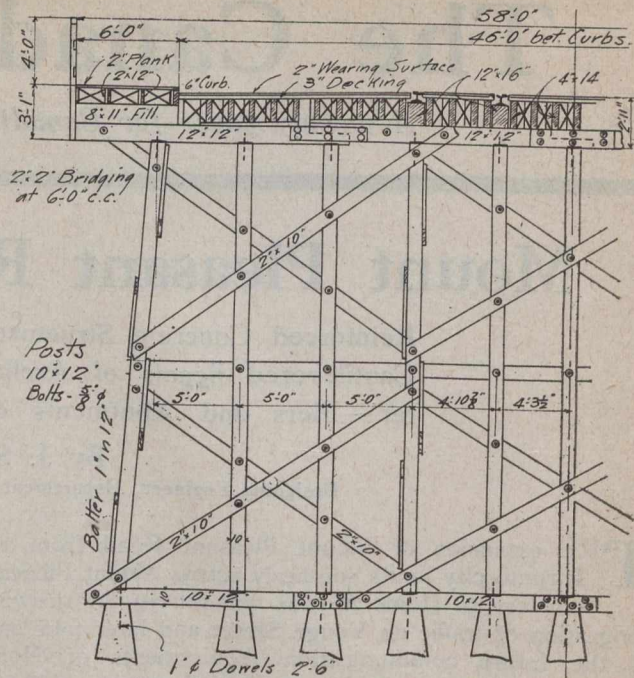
Typical Trestle Bent (Half Bent Shown)
